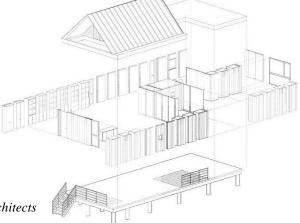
Furniture House 6. Source: Shigeru Ban Architects http://www.shigerubanarchitects.com/works/2009\_posthurricane-reconstruction-housing/index.html
